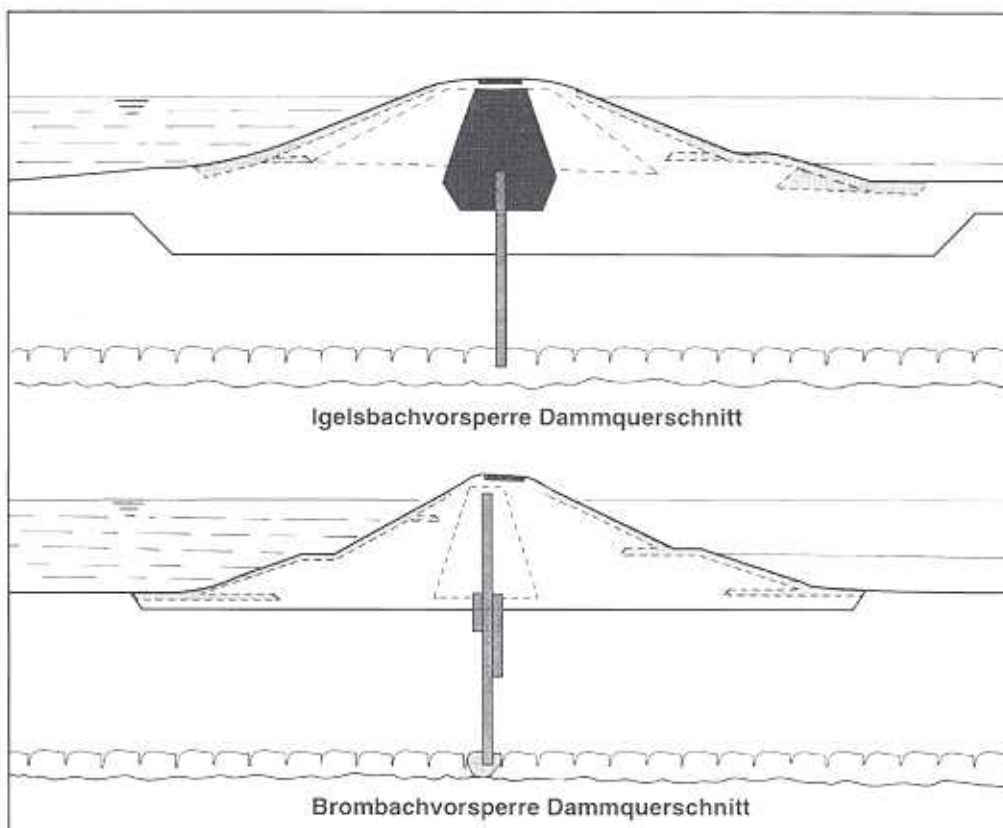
Waterproofing of dam foundations at Brombach (Germany) by jet-grouting in rock
